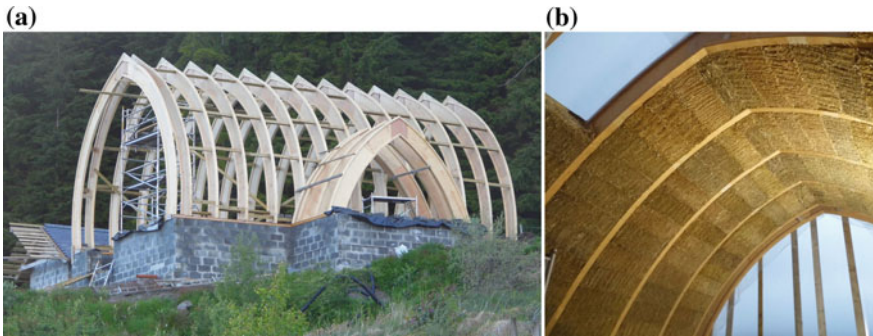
Construction of Jill Strawbale House [38], a cruck-frame of the building, b strawbale insulation between crucks
